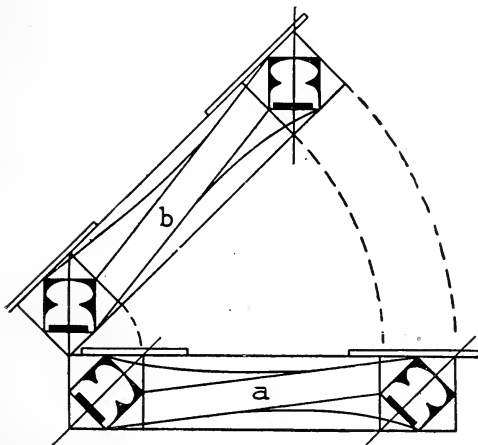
Twisted Wreath Raised to Position, with Sides Plumb.
